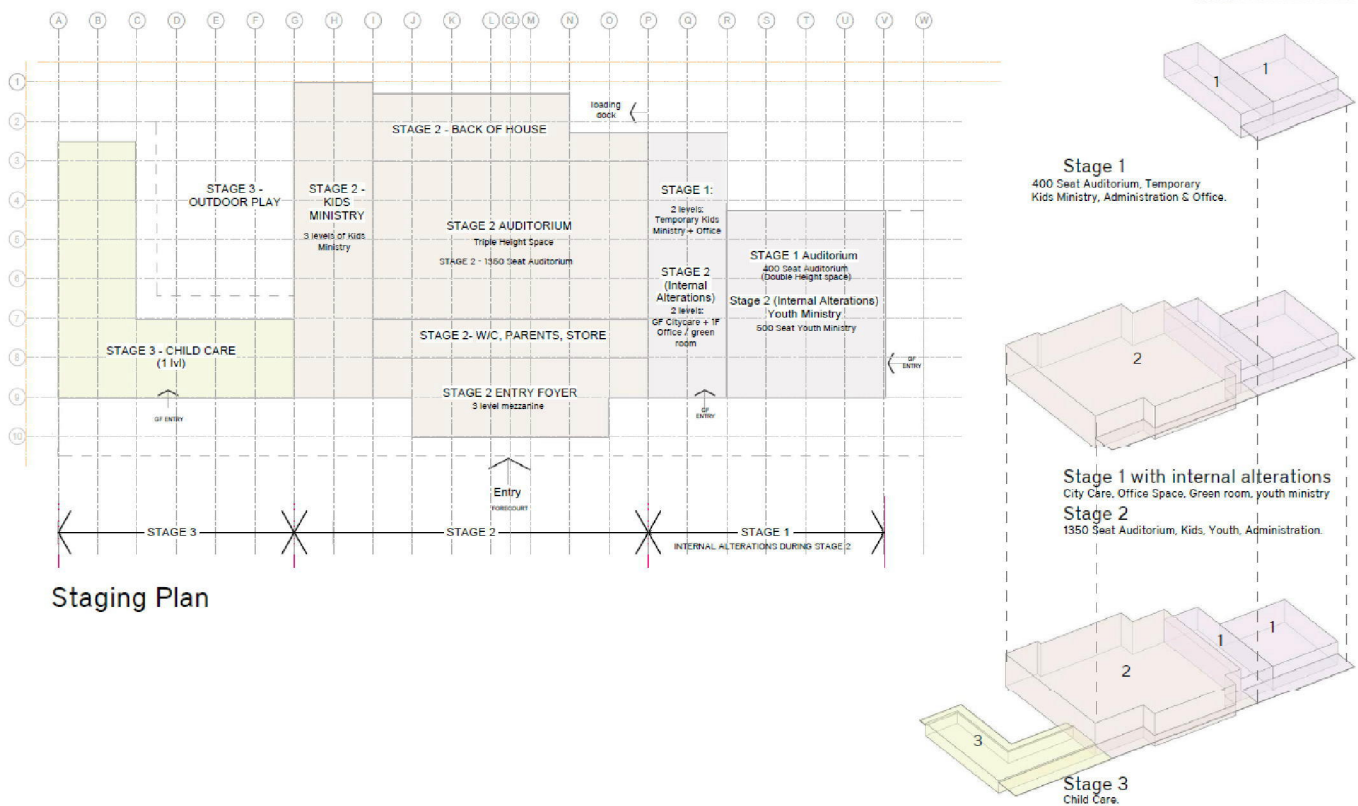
Staging Plan (Source: NBR Architecture 2017)
